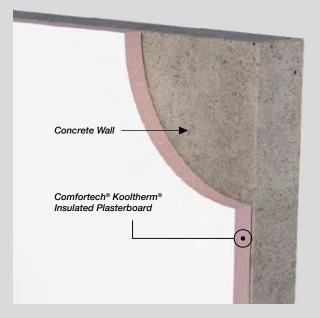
Comfortech® Kooltherm® Insulated Plasterboard adheres directly to concrete wall surface. Masonry Block Wall Comfortech® Kooltherm® Insulated Plasterboard
